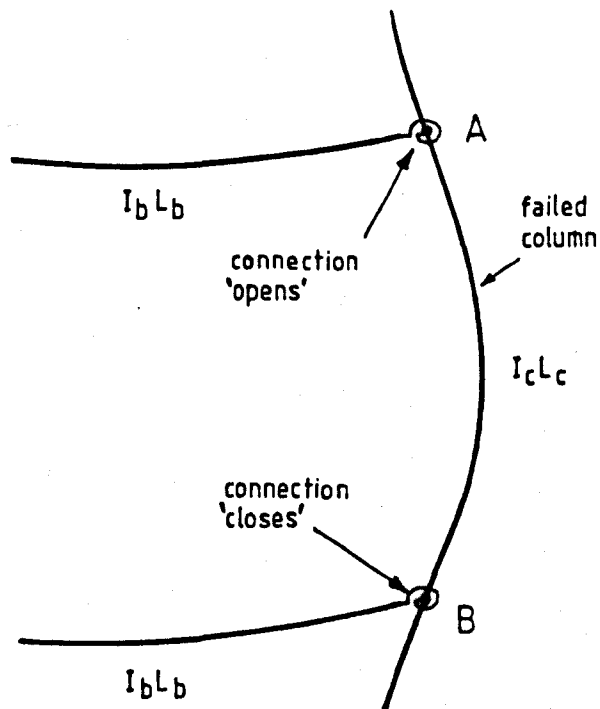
Buckled shape of an external column showing the direction of connection rotation.
